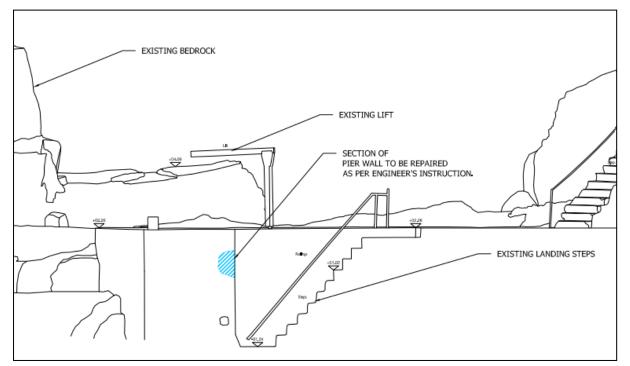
Proposed repair to section of seawall adjacent to steps at Landing Pier (Adapted from OPW Consent application documents)
